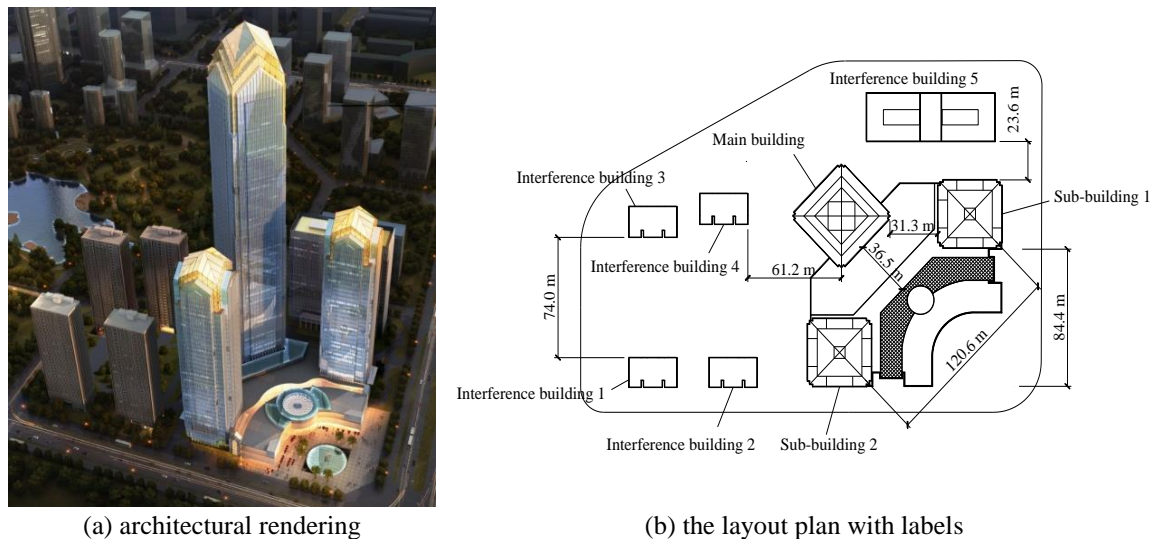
The buildings layout and labels of three-tower connected tall building with surrounding buildings
